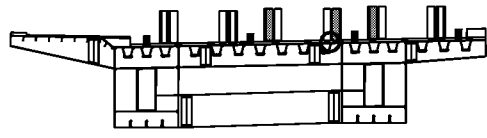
Fatigue Crack at the Weld between U-rib and Deck Plate
